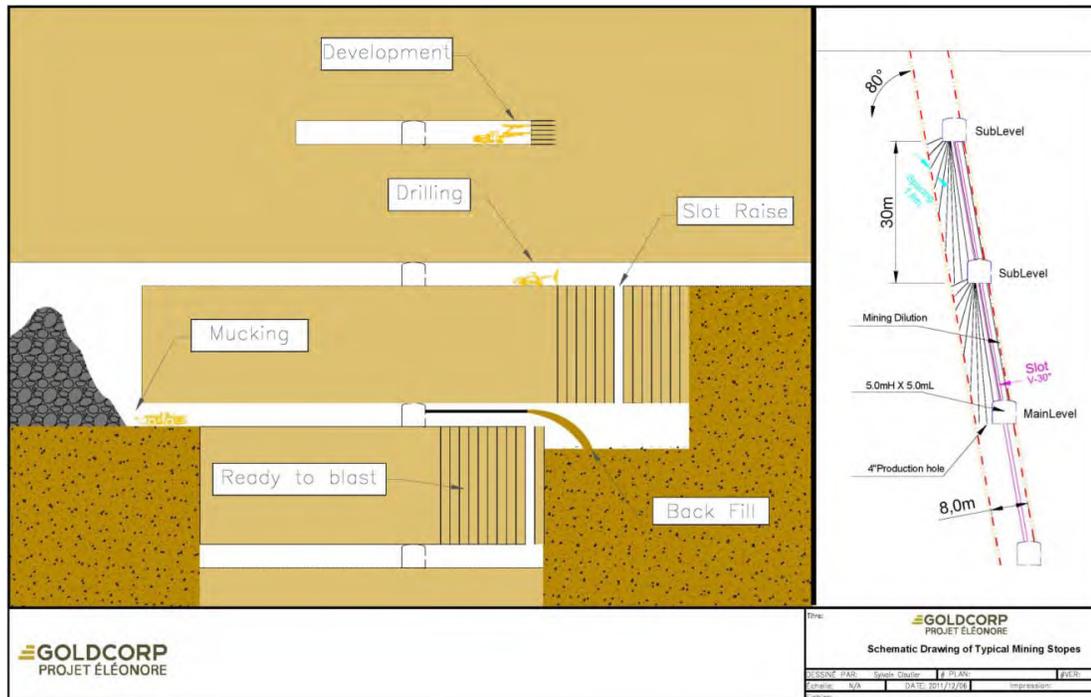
Longitudinal mining method with consolidated backfill – Longitudinal section
